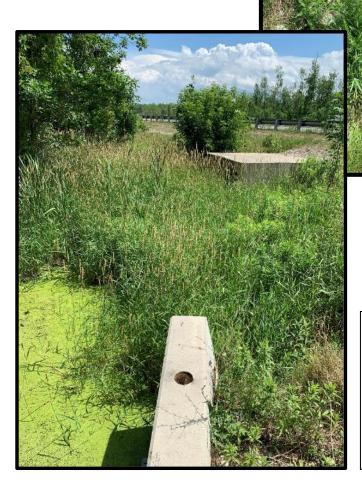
(above): Bayshore Creek has a secondary exit (spring overflow) at the southeast corner of Beachwood Road and Robert Street South. (July 29, 2021).
